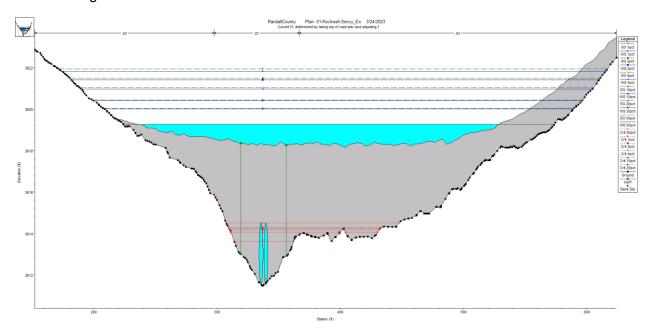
Upstream cross section at West Rockwell Road crossing of Spring Draw.
